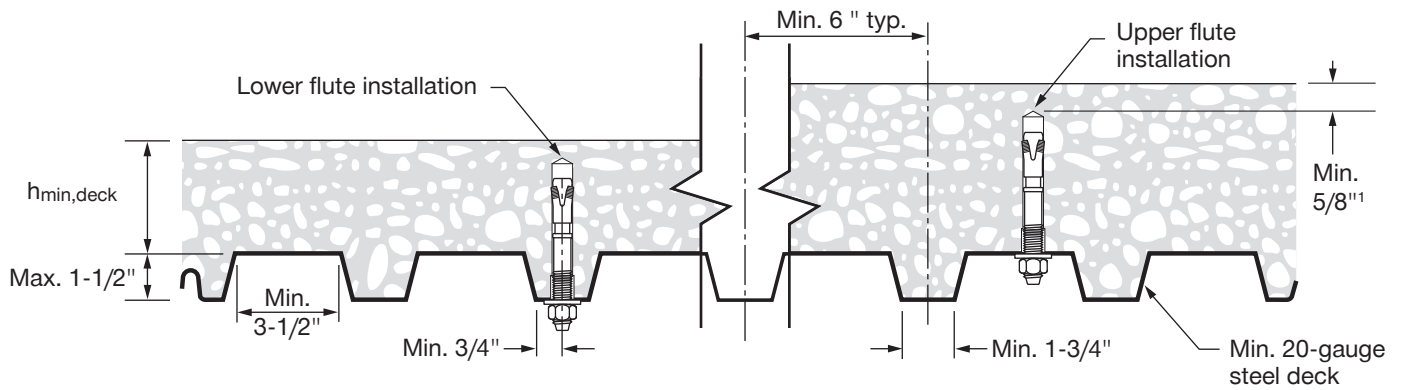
Installation of Hilti KB-TZ2 carbon steel in the soffit of concrete over metal deck floor and roof assemblies – B deck
